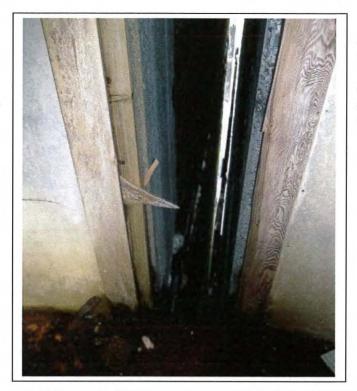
Representative 8inch "crumple" joint that separates the Buckner Building's seven structural sections. (September 8, 2014)
